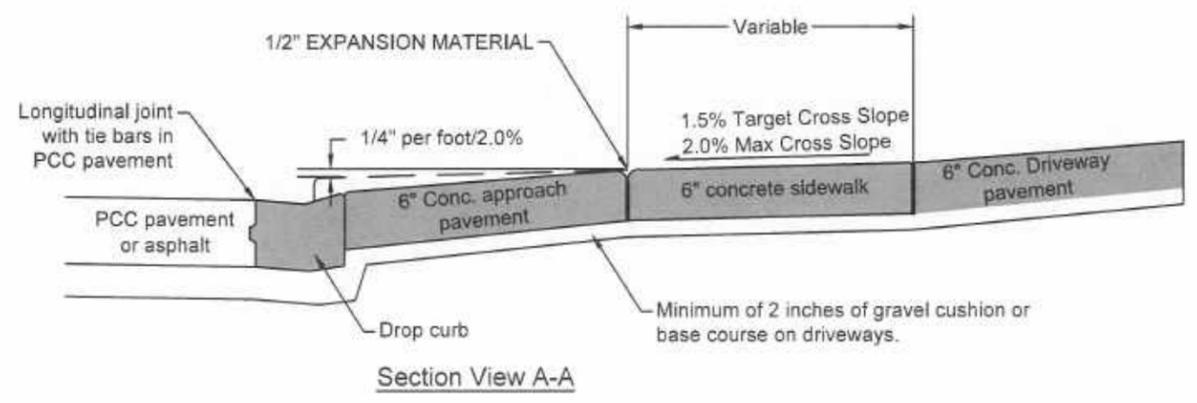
DETAIL FOR CONCRETE FLARES AND TAPERED CURB AT DRIVEWAYS
